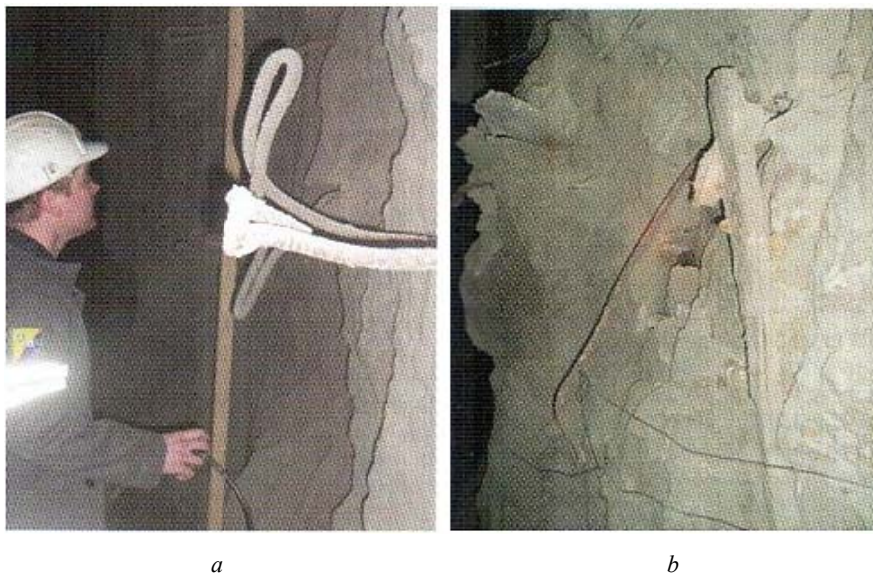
Stages of destruction of the working wall driven in the filling mass:
